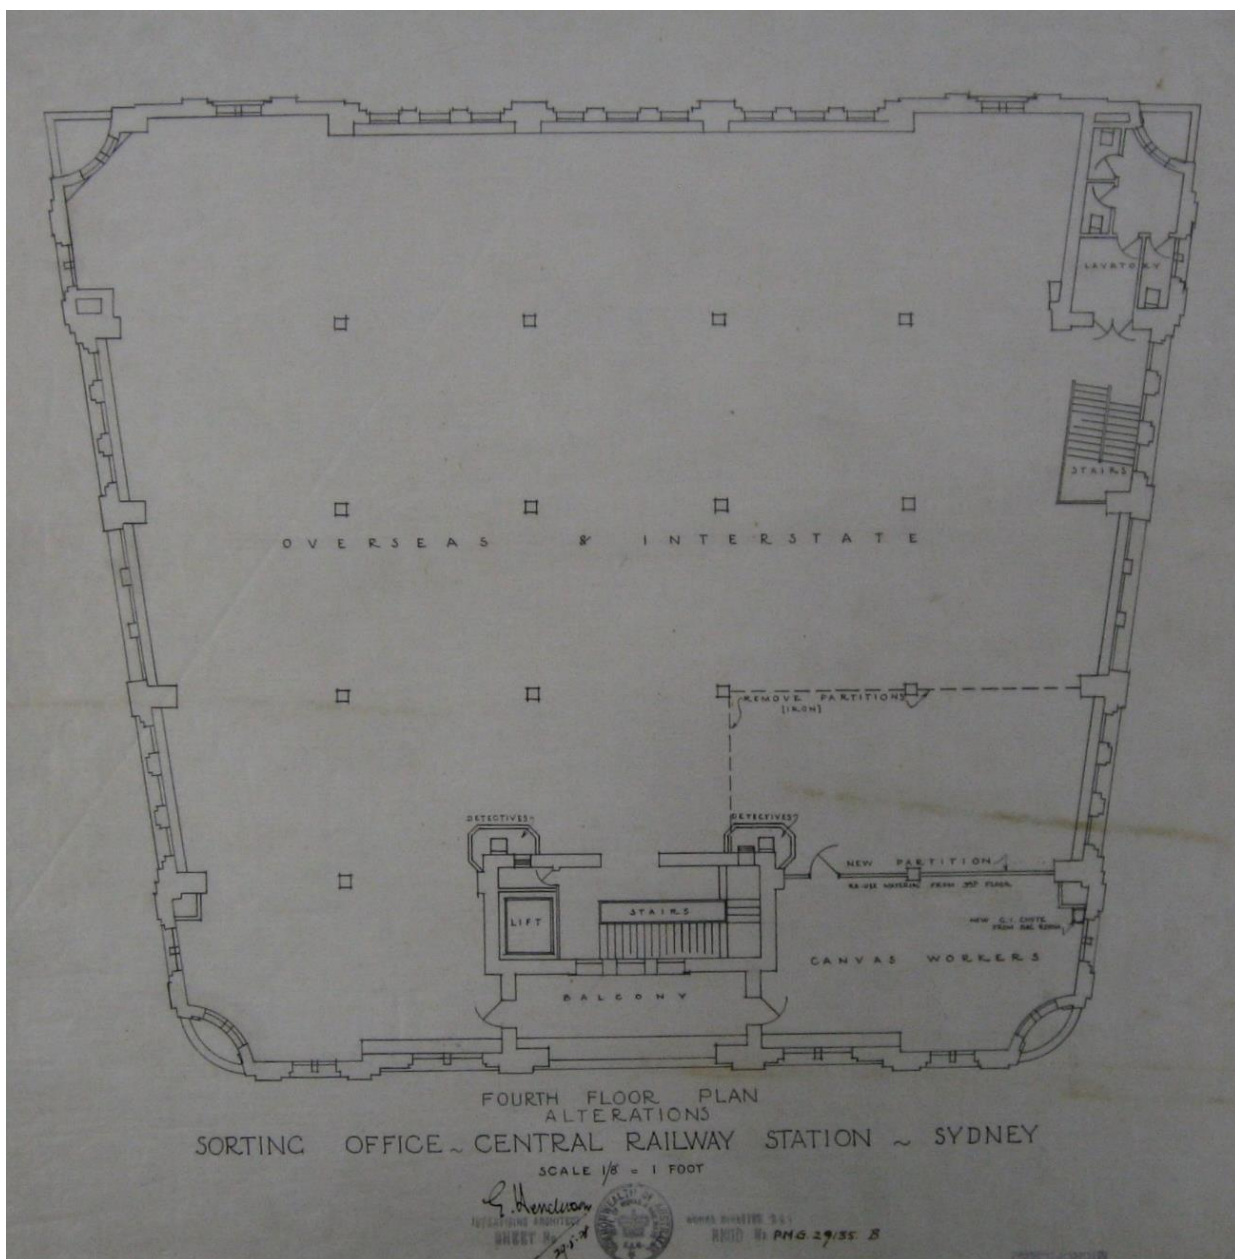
Sorting Office Central Railway Station Sydney, fourth floor plan alterations, 1929. Signed by G Henderson, Supervising Architect
